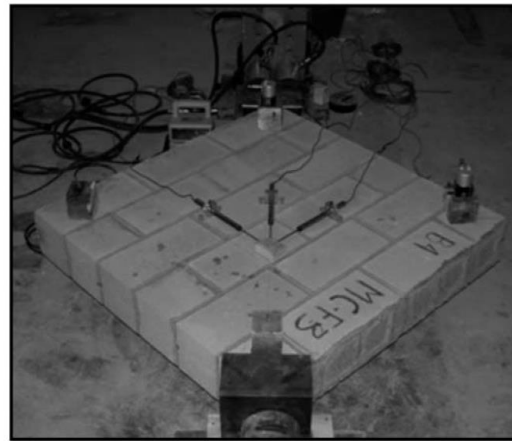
c) [2]. Fig.2-d) shows a sample of floor diaphragms constructed in the NRC's structural lab, which is representative of the construction method (combination of Side and End construction) in the Centre Block which consists of two skewers, four lengtheners and a key for single panel specimens.
